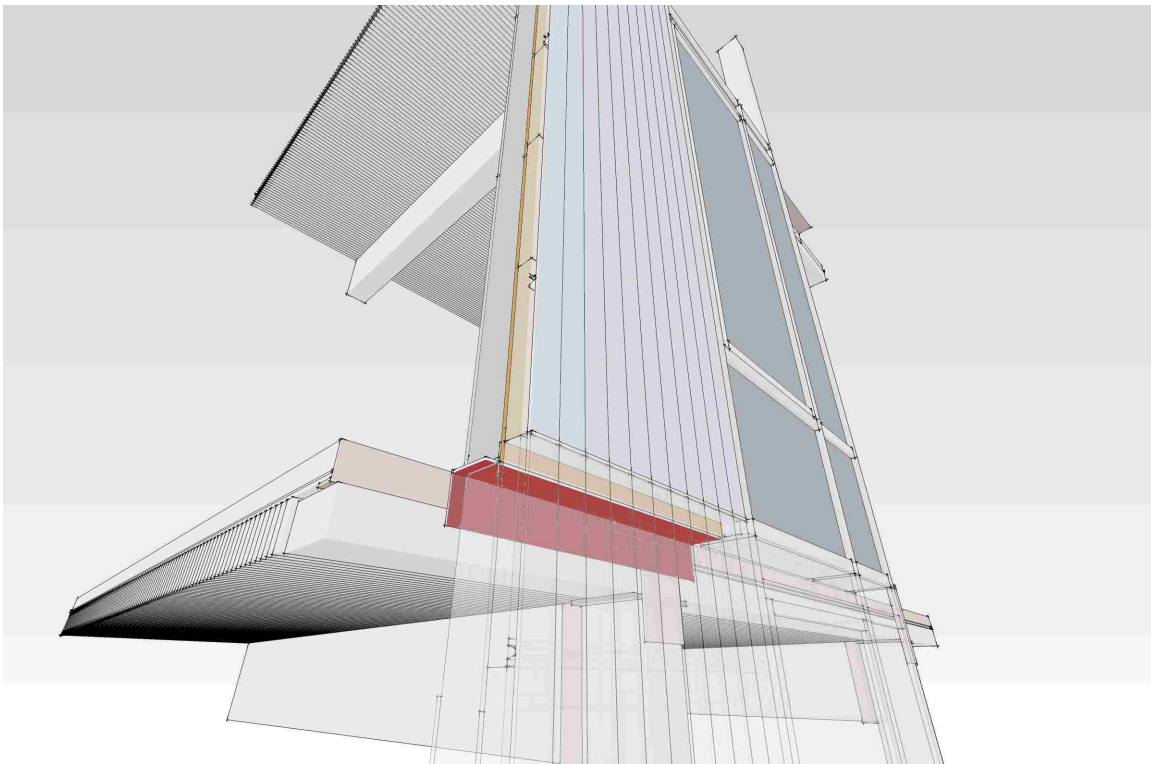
Exterior Wall Panel (sitting on steel ledger) and Glazed Curtain Wall companion
